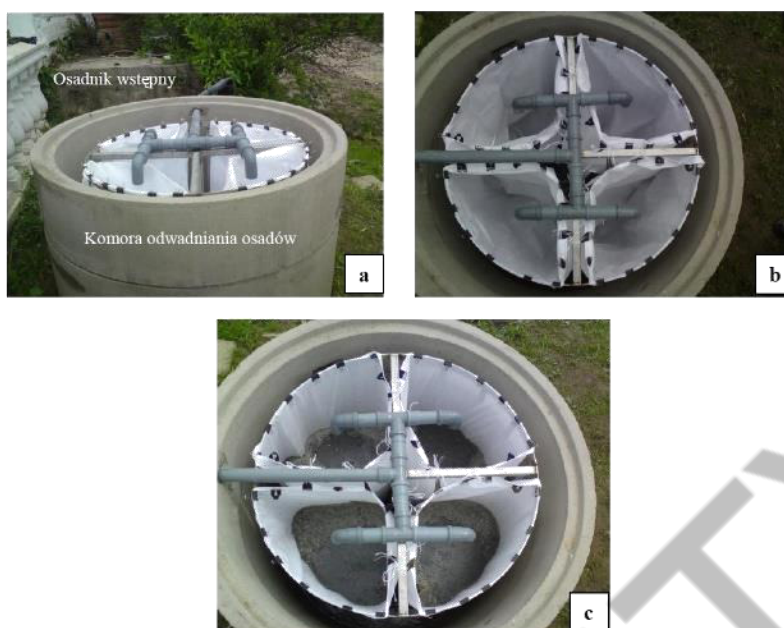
Installation for dewatering and disposal of sewage sludge produced in household wastewater treatment plants.
